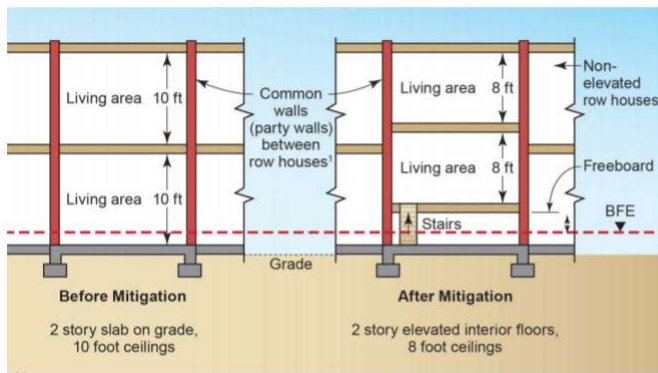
Raising the elevation of each floor for homes with high ceilings. The below-BFE space would be used solely for storage, parking, and ingress/egress. (Source: FEMA P-1037)
